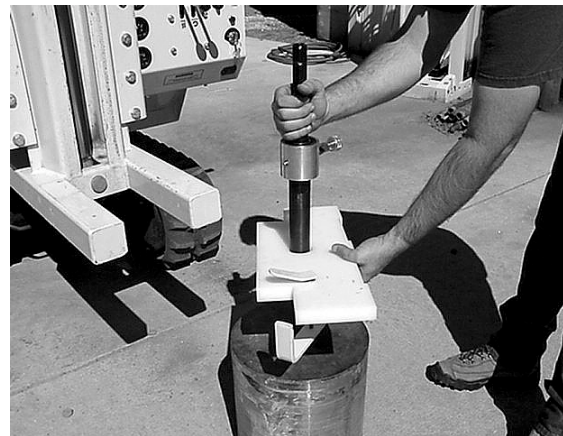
Insert bit extension/water swivel assembly through center of plate and thread into diamond core bit.
